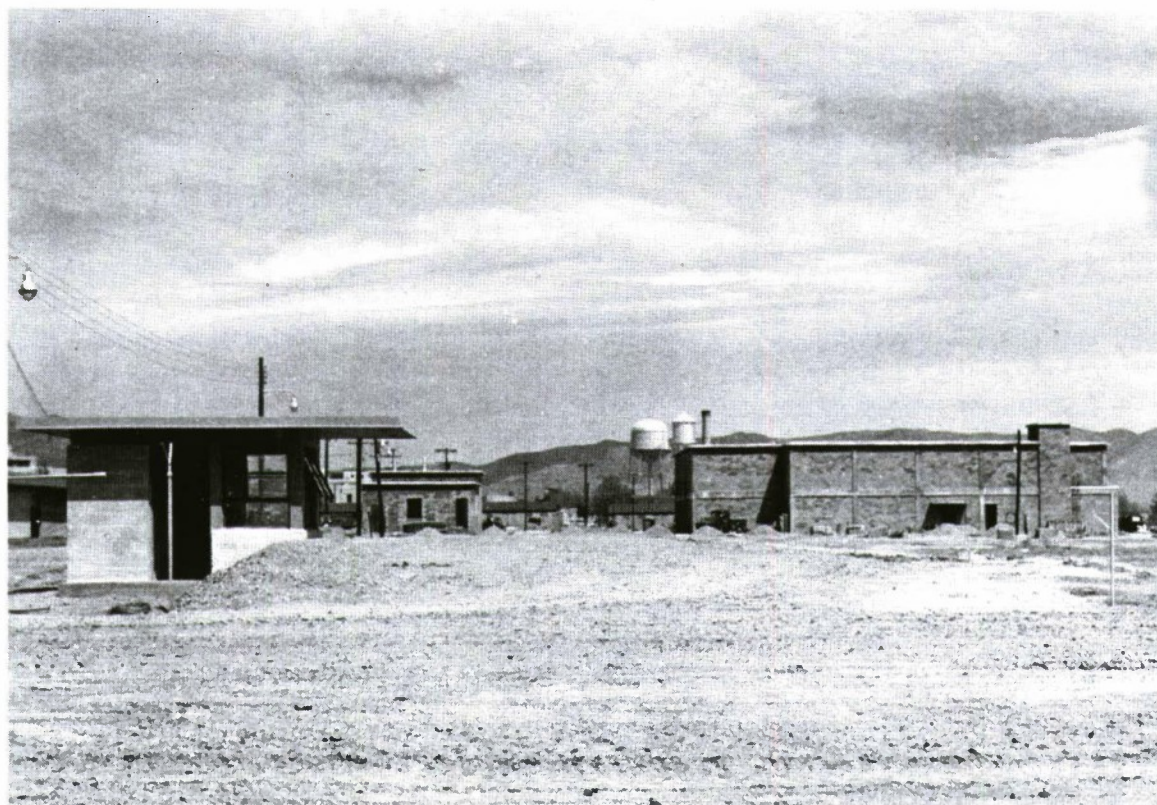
Holabird, Root & Burgee. ADCC (Type 4 Operations Building) for the 34th Air Division (Defense) (Building 909), Kirtland Air Force Base, right. Guard station (demolished) and ancillary structures (Buildings 910-913), left. Designed 1949, constructed at Kirtland in 1950-1951. In *Historical Data 34th Air Division (Defense) 1 January – 31 March 1951*.
